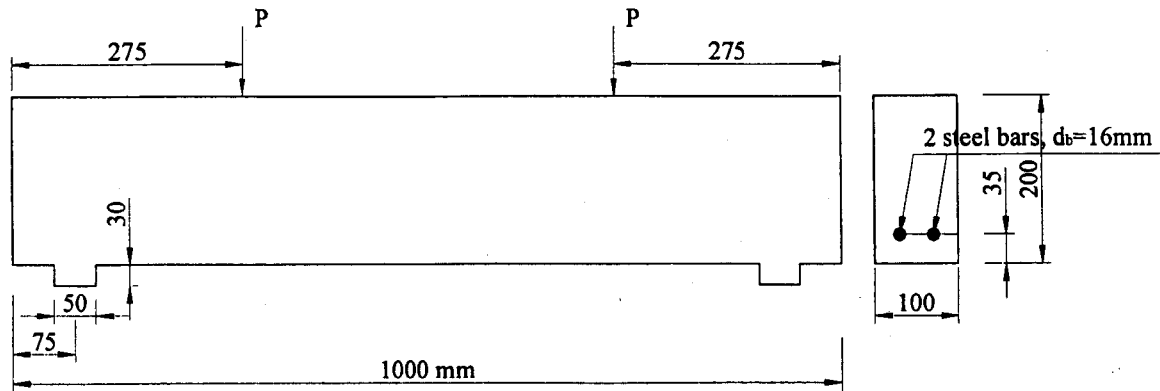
Dimensions of Simply Supported Beam (Specimen III)
